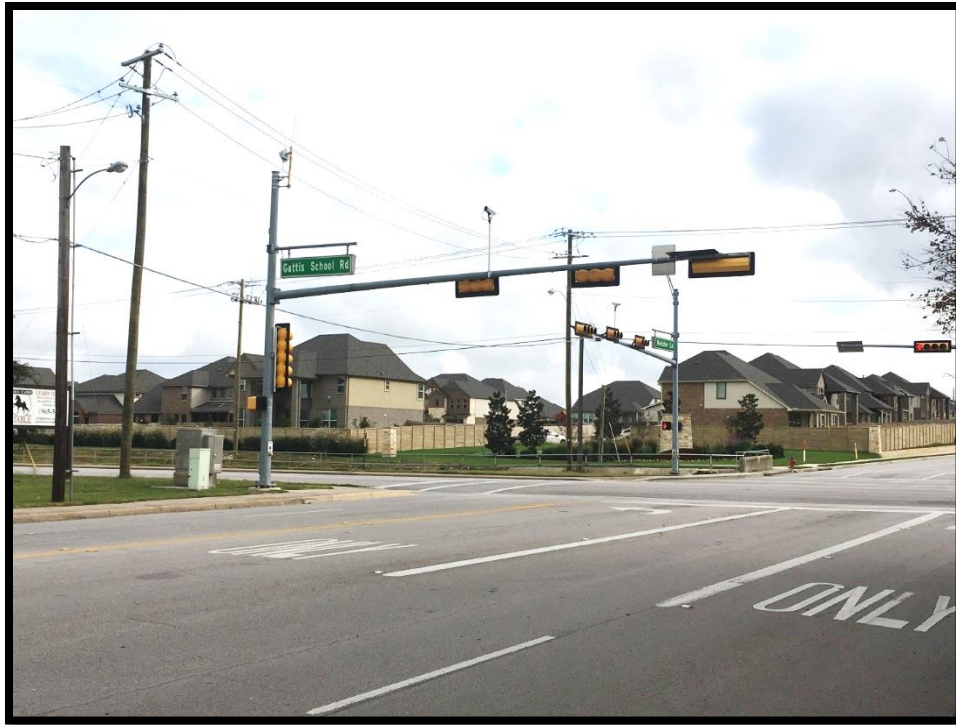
Facing north toward Gattis Elementary School and Round Rock Ranch Boulevard.
